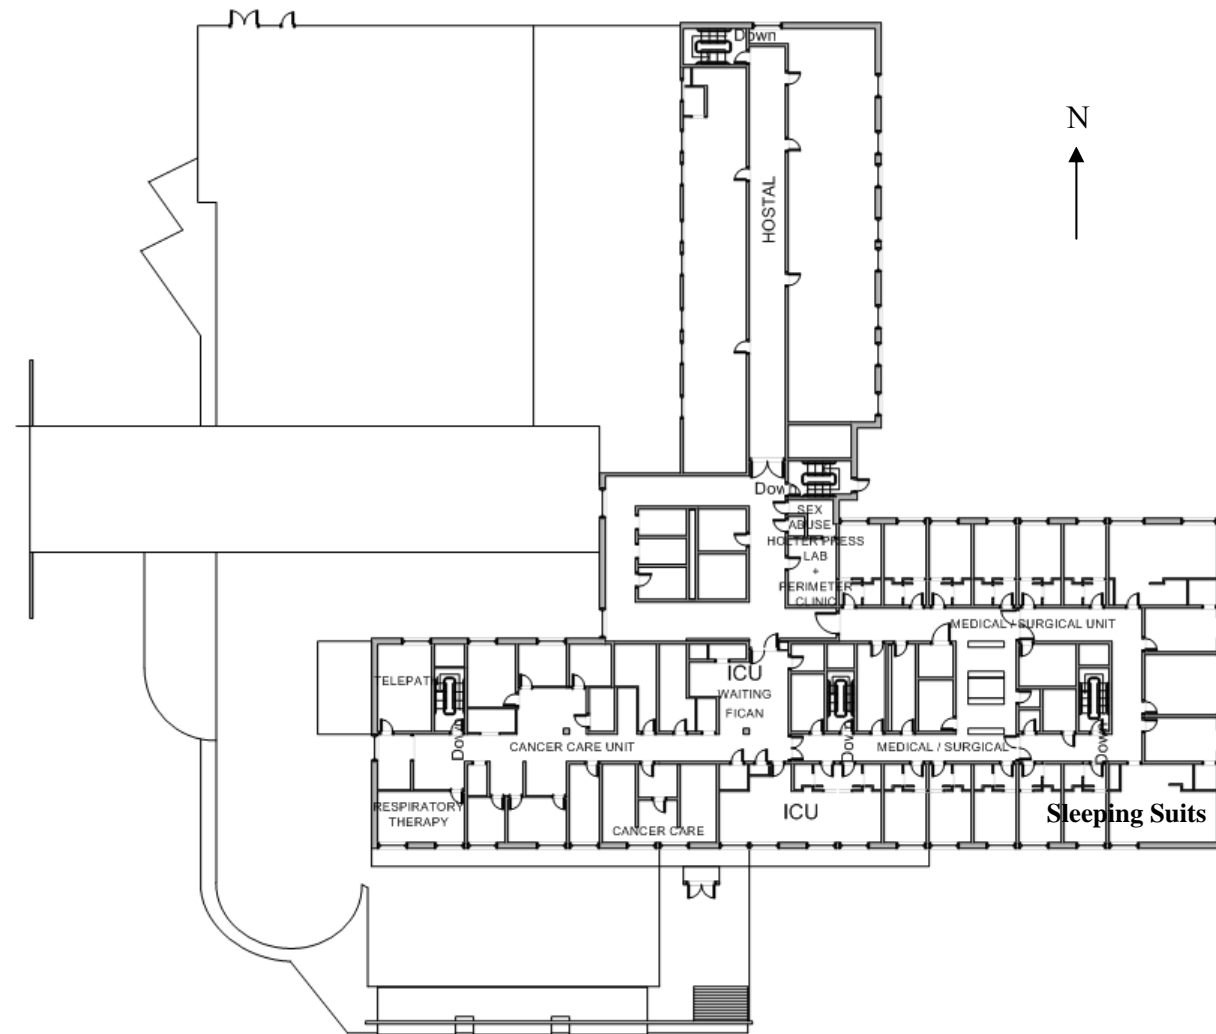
Plan view of floor 3 in hospital (not to scale)
